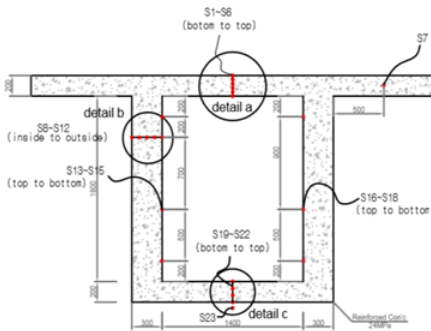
Section plan and thermo-gauge location in the bridge specimen
